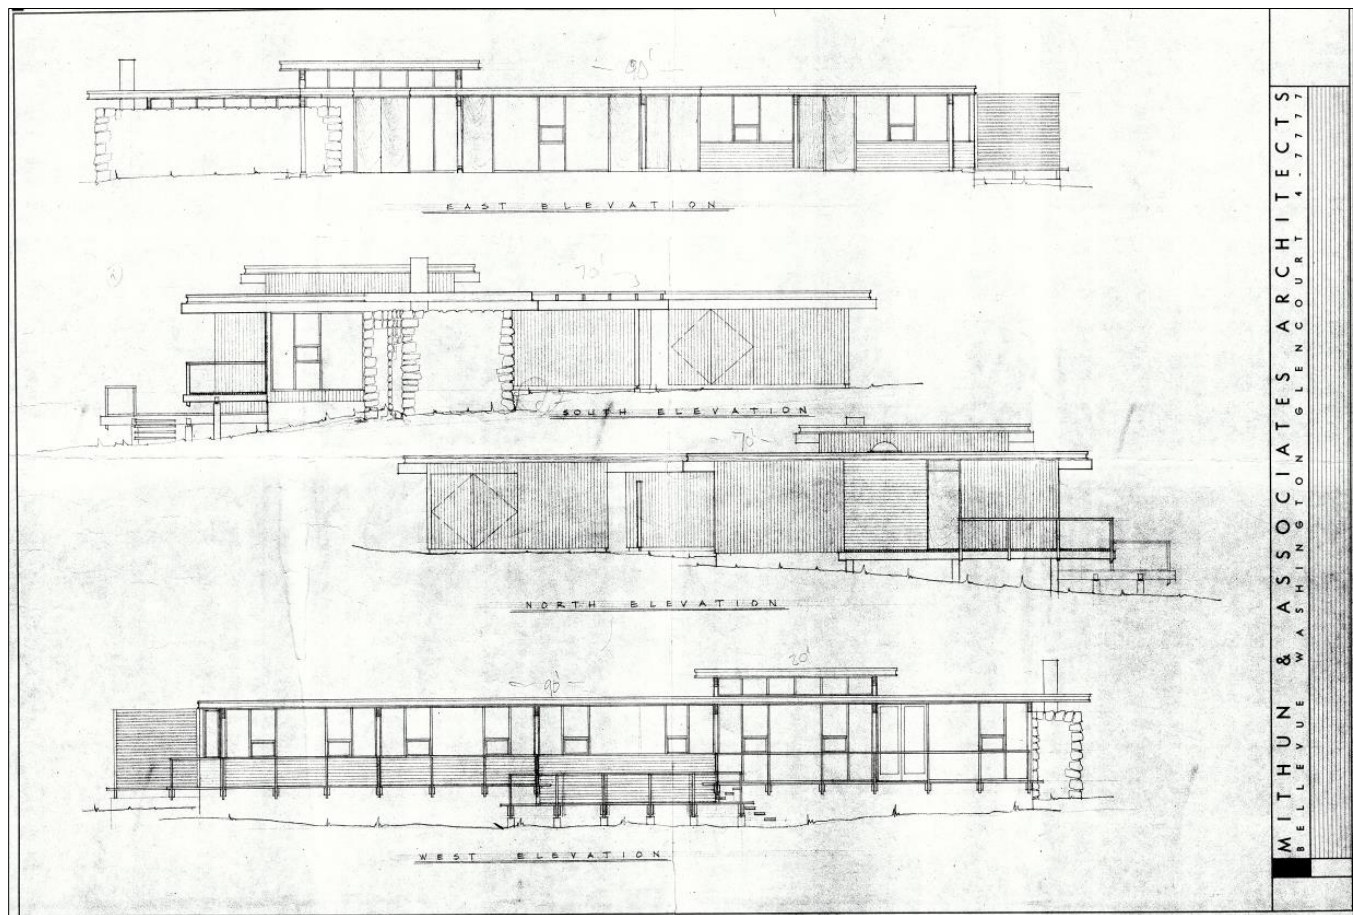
Elevation drawings, Mithun & Associates Architects, undated draft. Source: Louise Bruse Wenberg Luce private collection.
